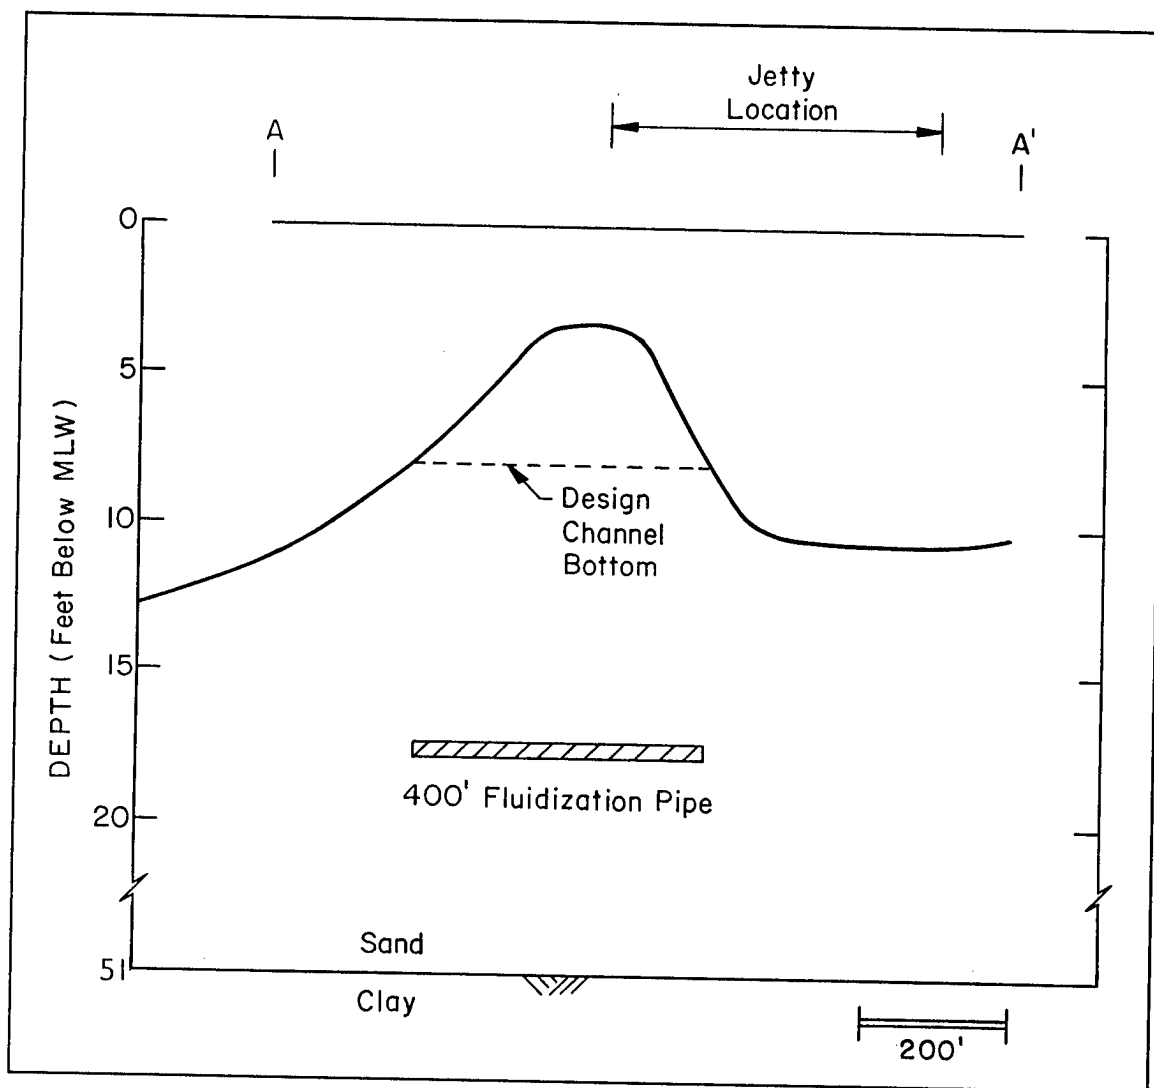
Cross section AA' showing location of fluidizer pipe and initial and final channel bottom for Example 1
